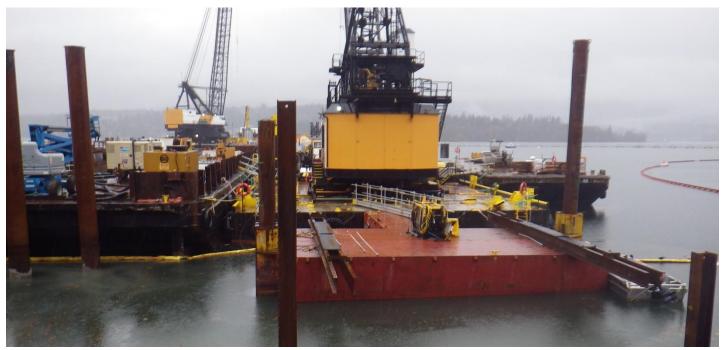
Preparatory works to install the brace frame at sheet pile cell 10.
